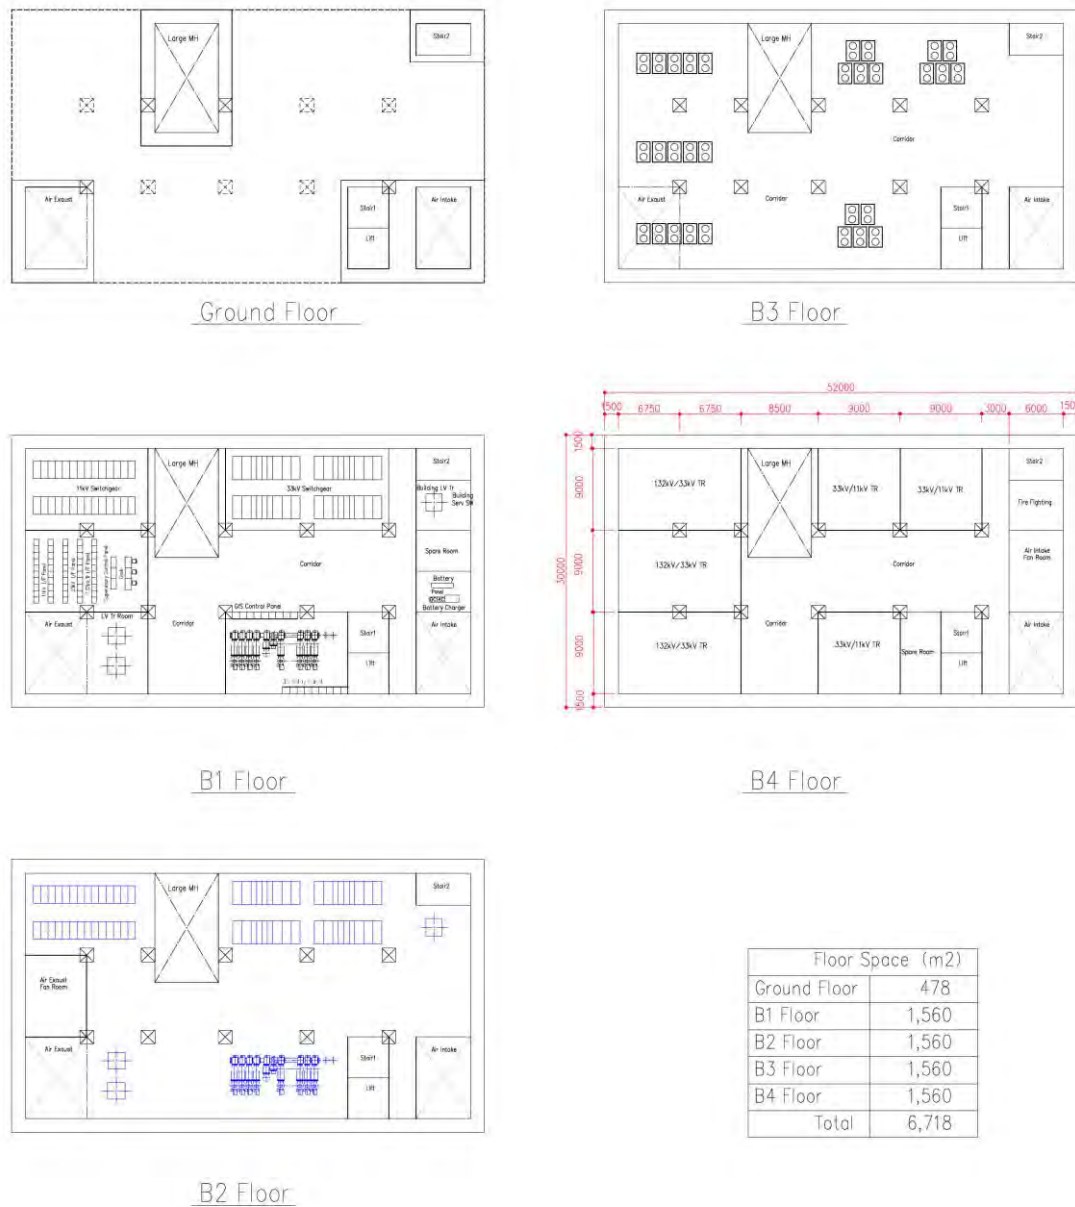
Floor layout of Kawran Bazar Underground Substation (Plan B)
